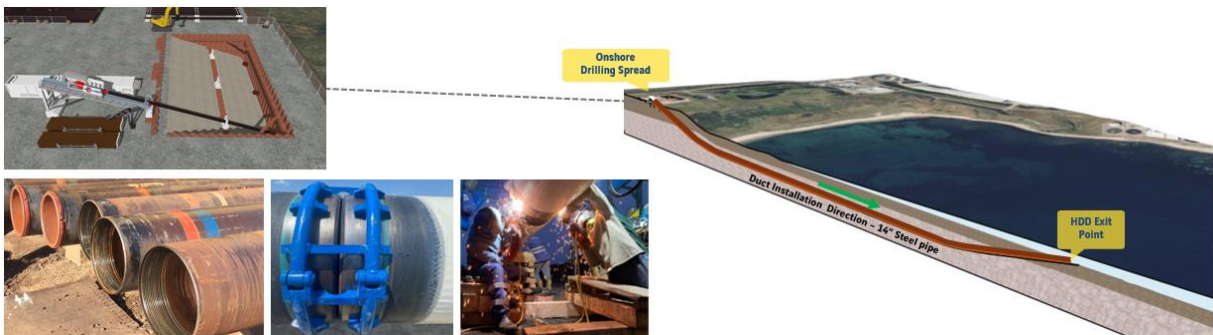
Installation of 16" Steel ducts (pushing) schematic
